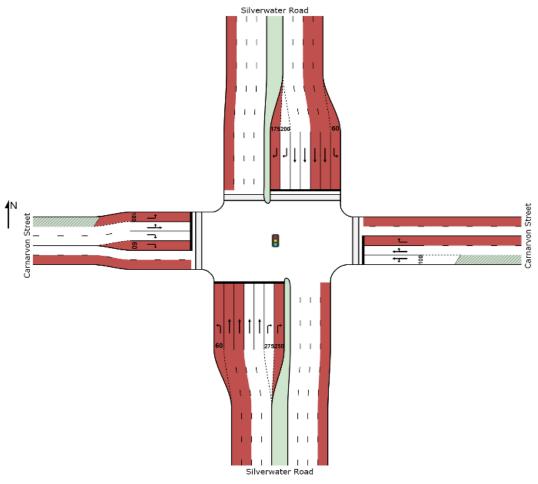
Intersection of Silverwater Road and Carnarvon Street
